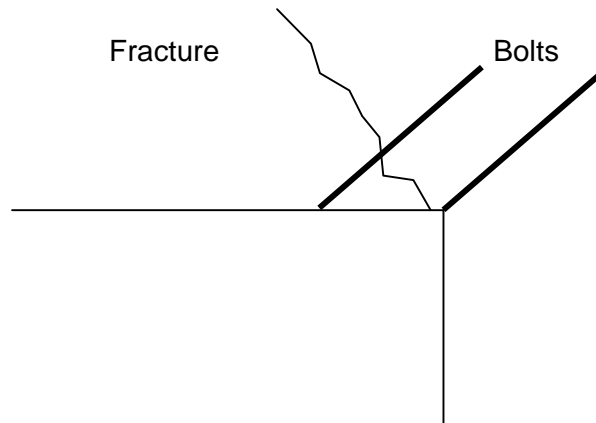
Cross section of the corner of a roadway, showing how an inclined bolt a short distance away from the ribside penetrates the fracture plane.
